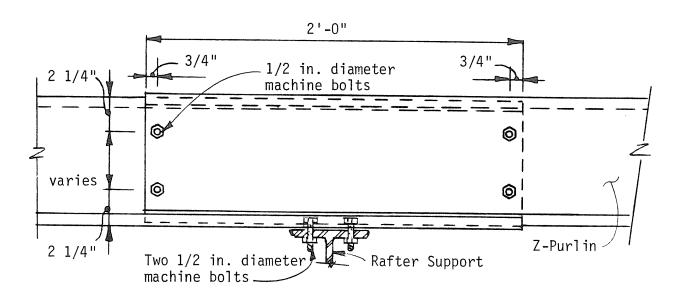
Details of Interior Purlin Connection Used in Continuous Span Tests
